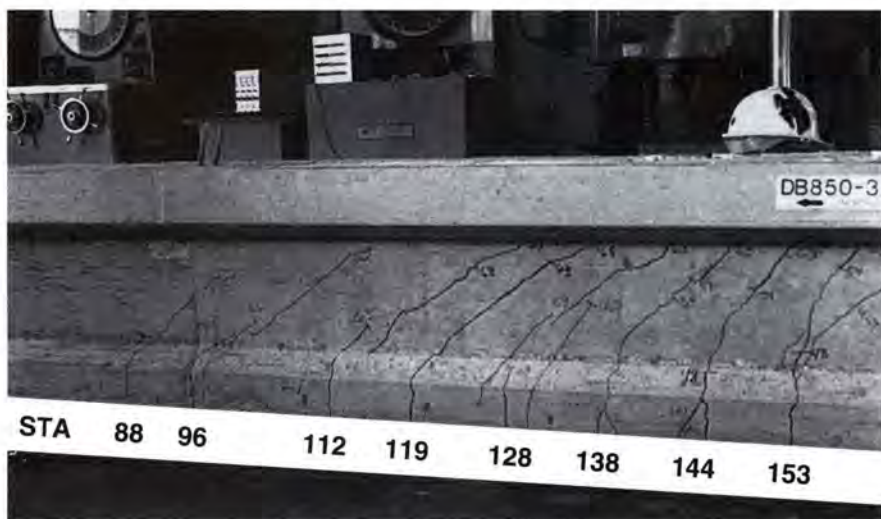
Cracking pattern for Test DB850-3A — Cracking in the debond/transfer zone and bond failure of debonded strands.
